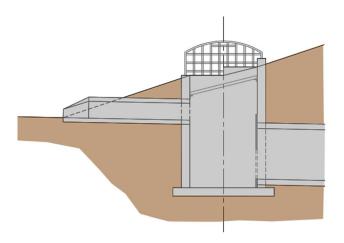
A typical design of a multi-stage outlet structure (Figure 9.09-1-2 ISWMM).
